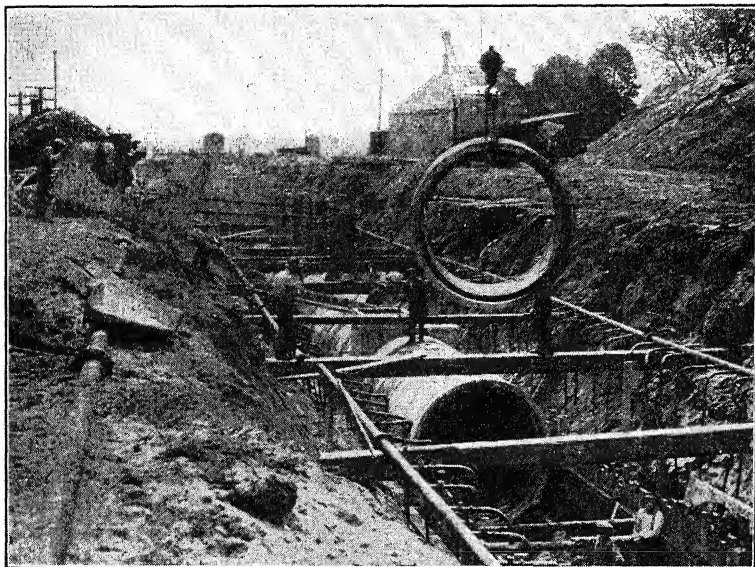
Sewer trench unwatered by well-points and pumps.
